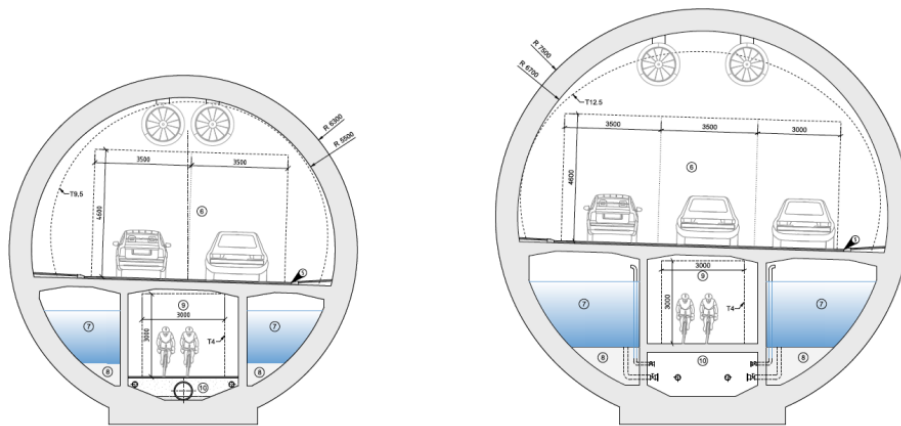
Tunnel general cross-section (left) and lay by cross-section (right), [Olsen et al., 2016]
